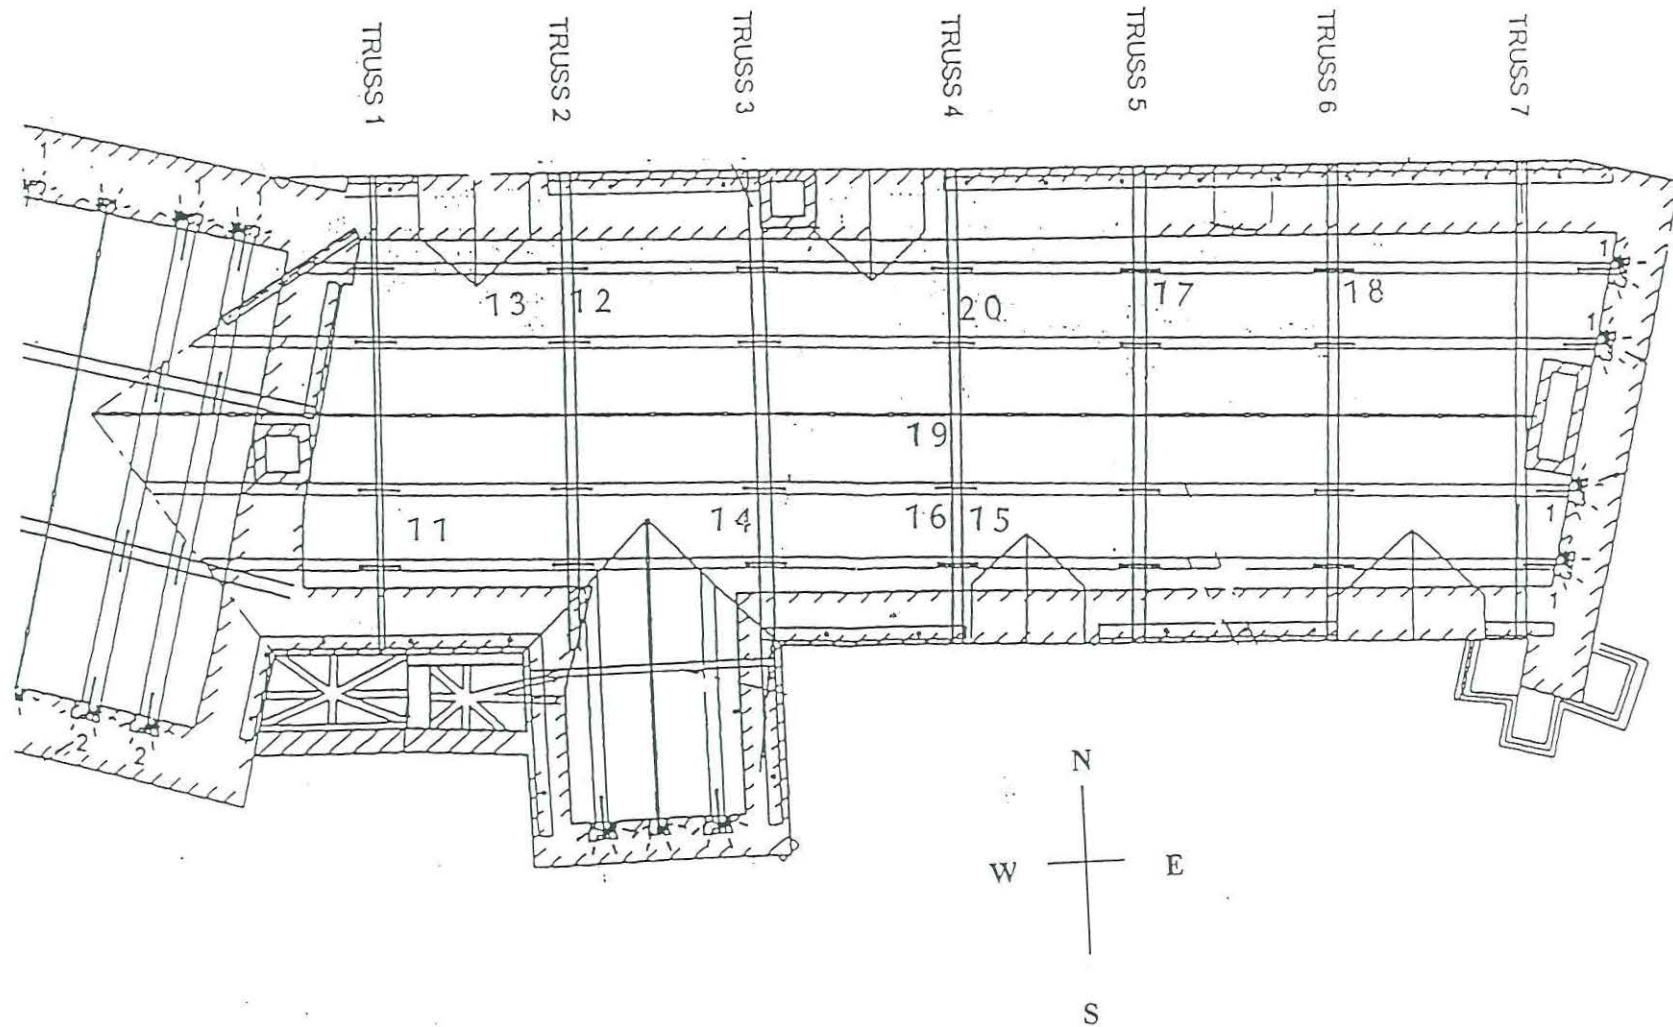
Drawing to show positions of samples from the trusses of the gatehouse roof
